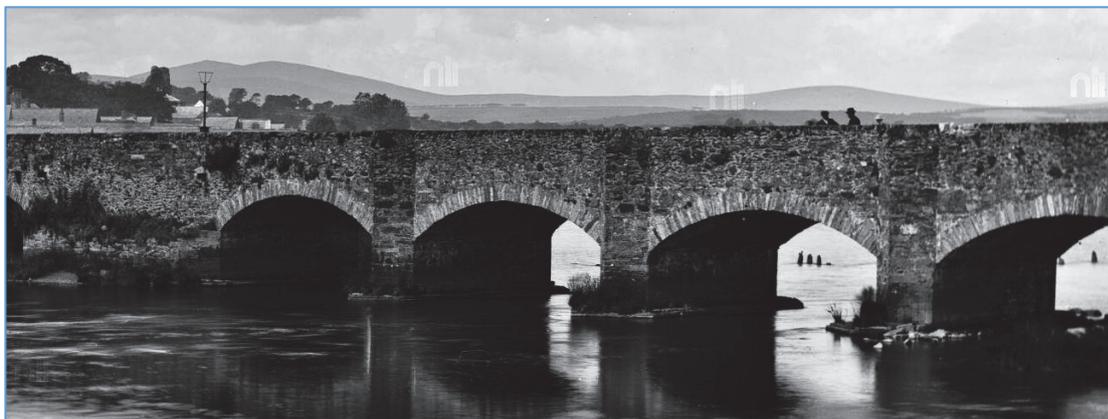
Arklow Bridge, photographed by Robert French (1841-1917), detail of showing timber posts lying upstream of the bridge on its east side.
